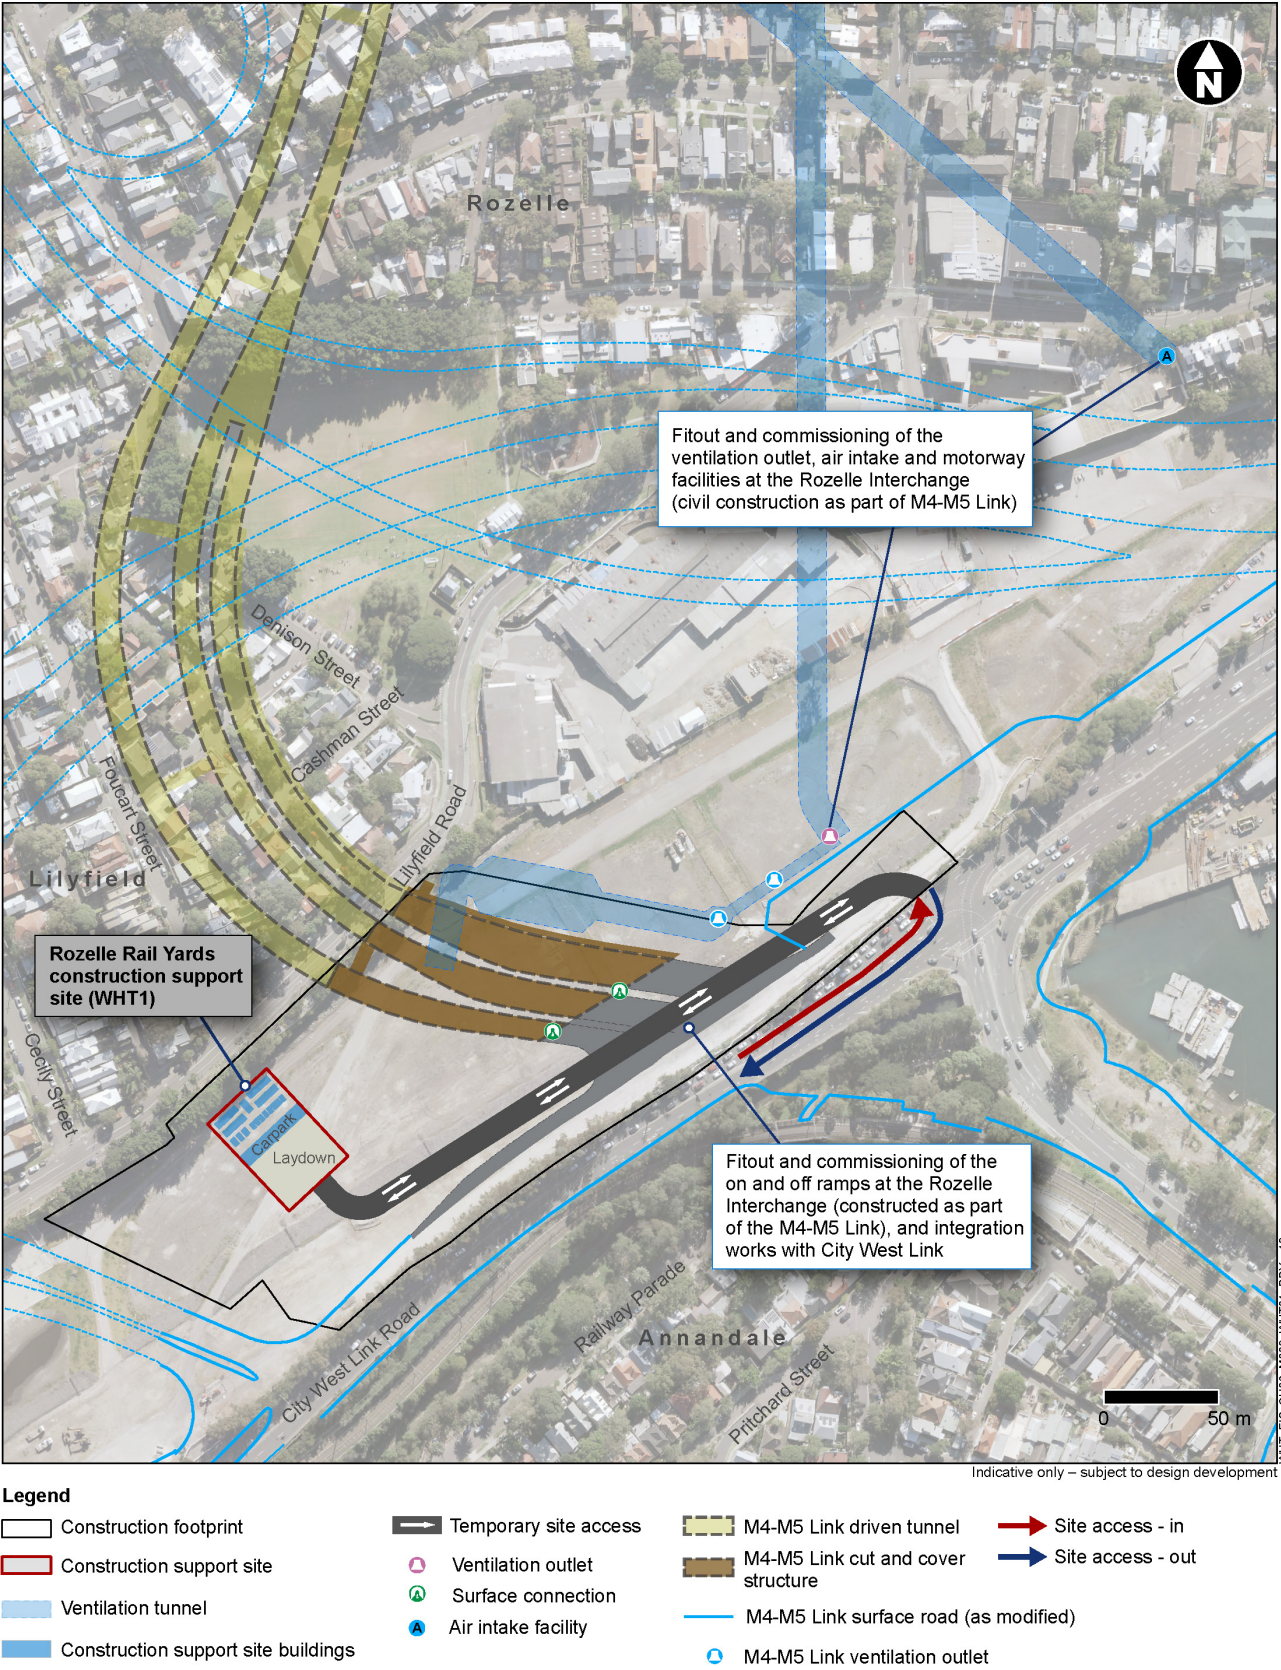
ROZELLE RAIL YARDS CONSTRUCTION SUPPORT SITE (WHT1) (WHT1) LAYOUT
